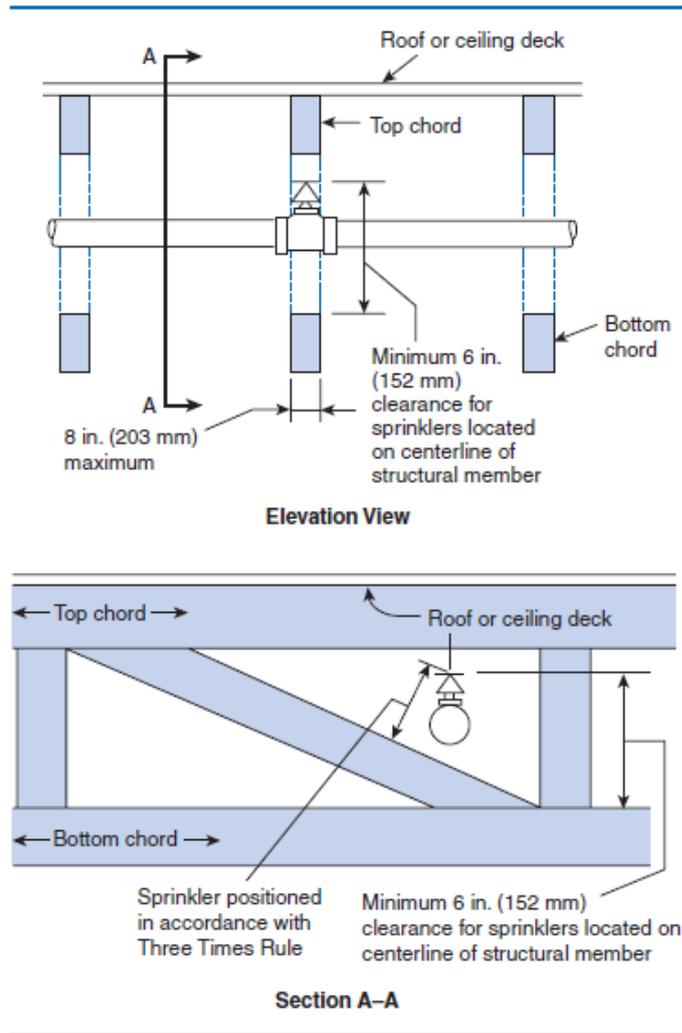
Location of Sprinklers in Open Truss Construction.
